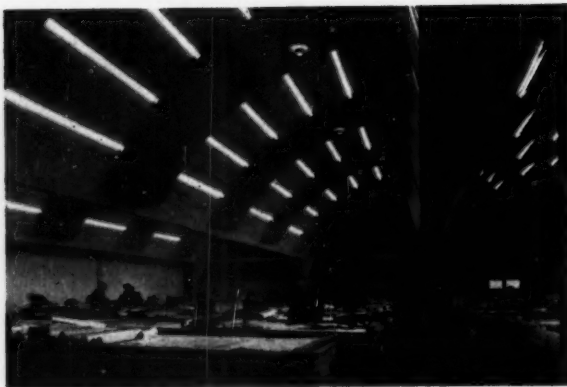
Example of barrel vault ceiling. Architect, Richard Sheppard, F.R.I.B.A.
